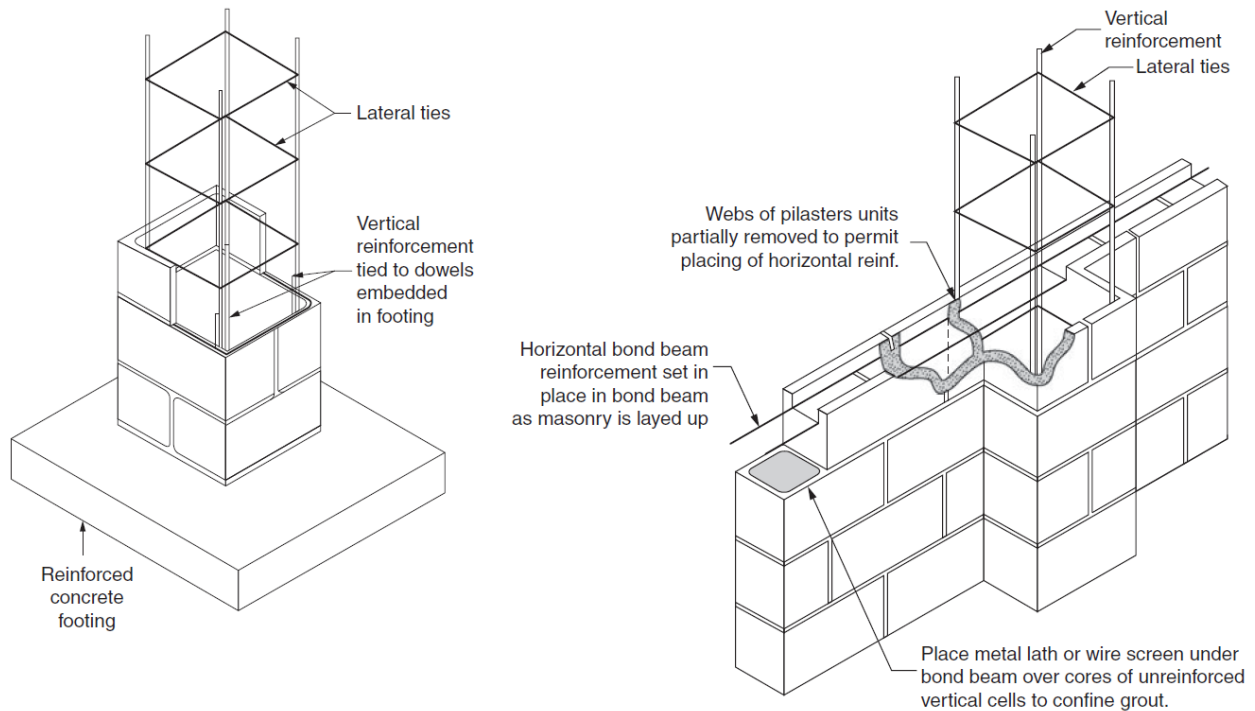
Reinforced isolated and wall columns (Taly, 2010).
